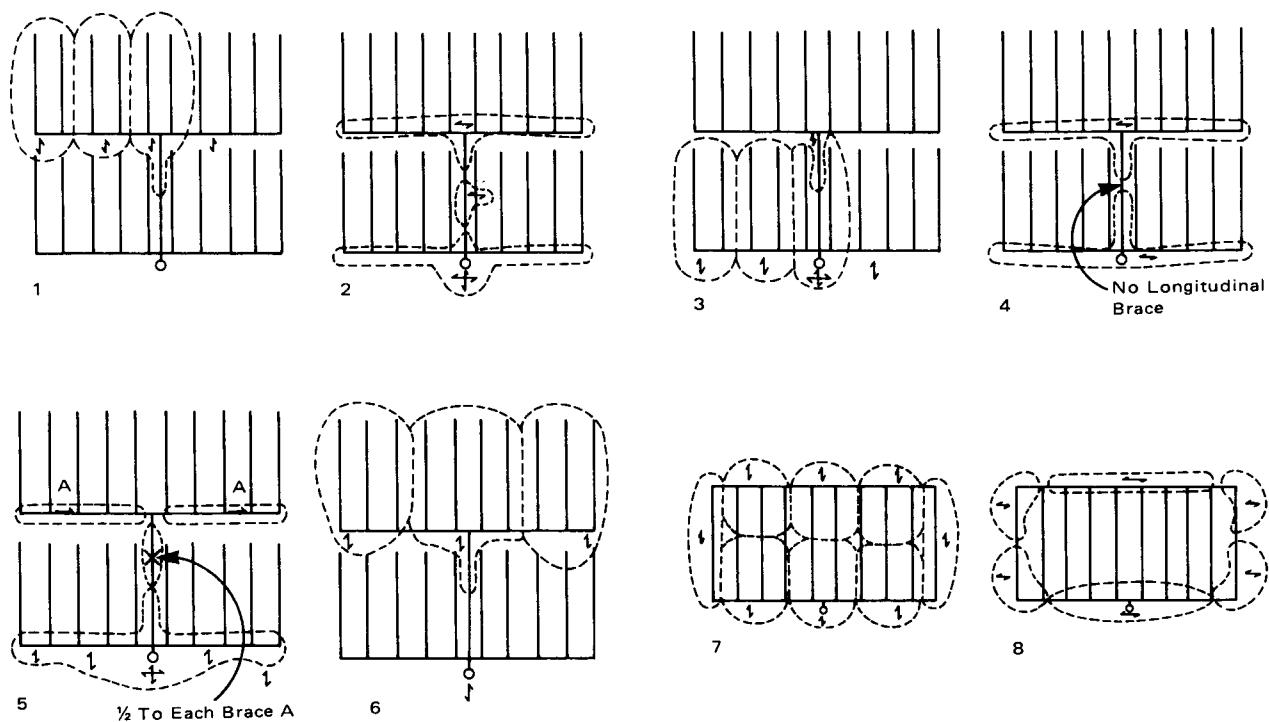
(h) Examples of load distribution to bracing.
